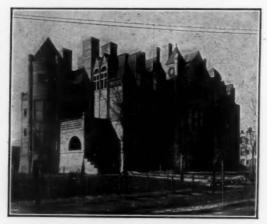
TYPICAL OLD THREE-STORY SCHOOL BUILDING OF NON-FIRE-RESISTIVE CONSTRUCTION
